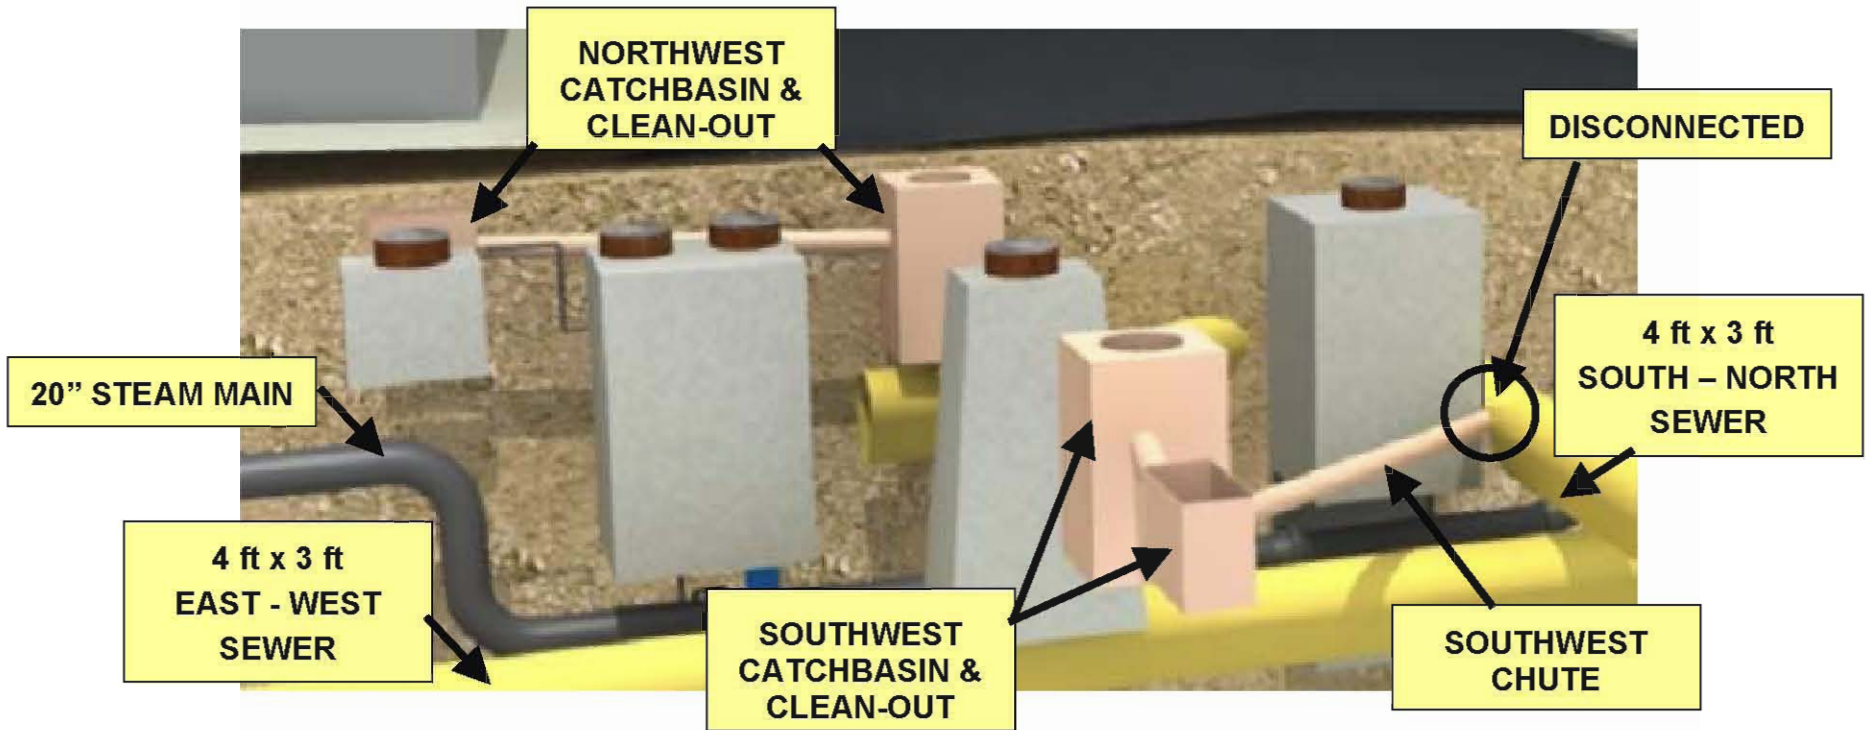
Arrangement of West Side Catch Basins Looking North
